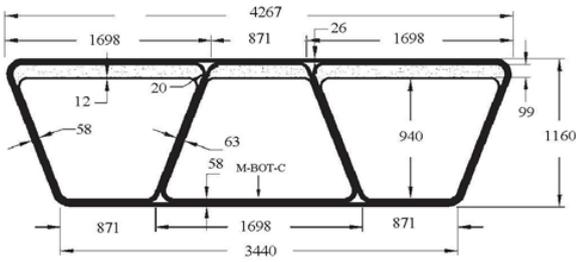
CROSS SECTION OF THE HYBRID FRP-CONCRETE SUPERSTRUCTURE (DIMENSION IN MM)
